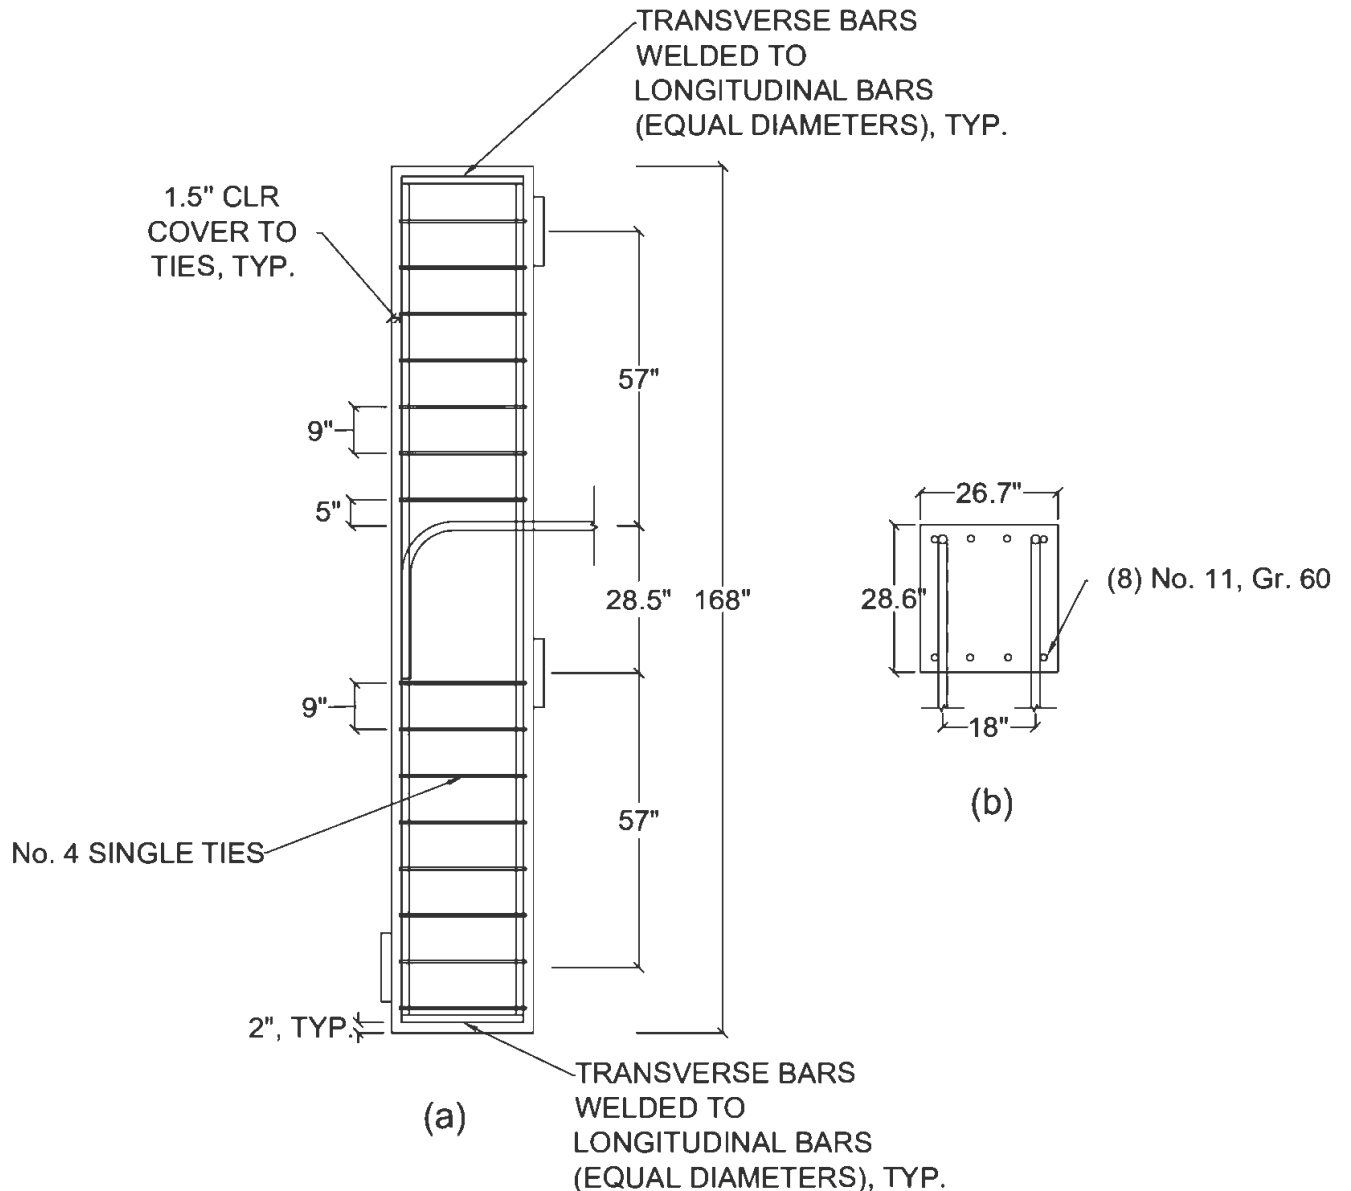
Details of reinforcement layout for No. 14 hooked bar specimen H14-1: (a) elevation, (b) cross-section
